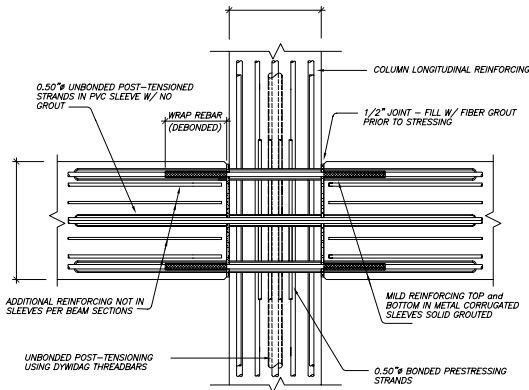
Jointed precast “hybrid” beam-column connection in the PRESSS program ([4],[5])
